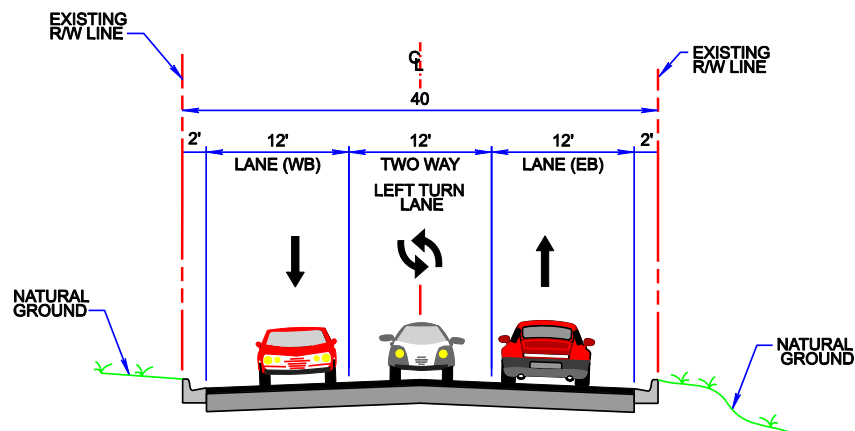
F NW 122nd Way from NW 107th Avenue to NW South River Drive (2028)
